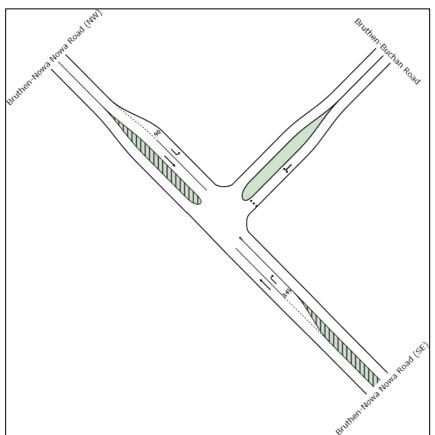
Schematic Intersection Layout of Bruthen-Buchan Road and Bruthen-Nowa Nowa Road
